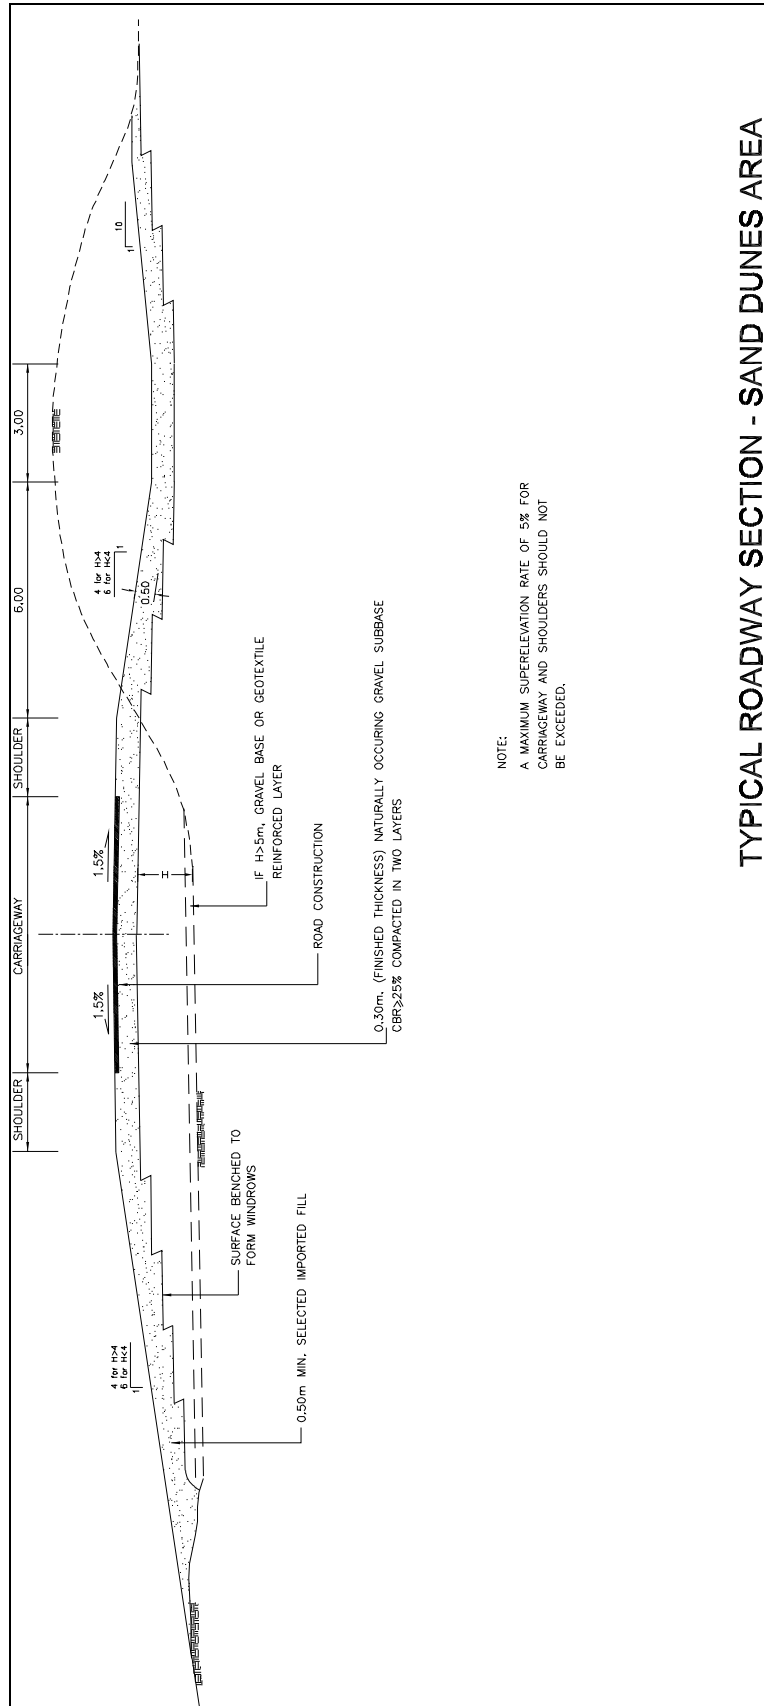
Typical Cross-Section at Sand Dunes
